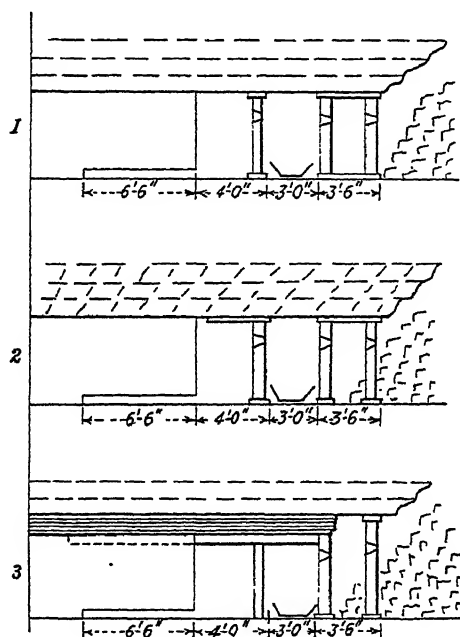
ARRANGEMENT OF JACKS WHEN IMMEDIATE ROOF IS STRONG.
